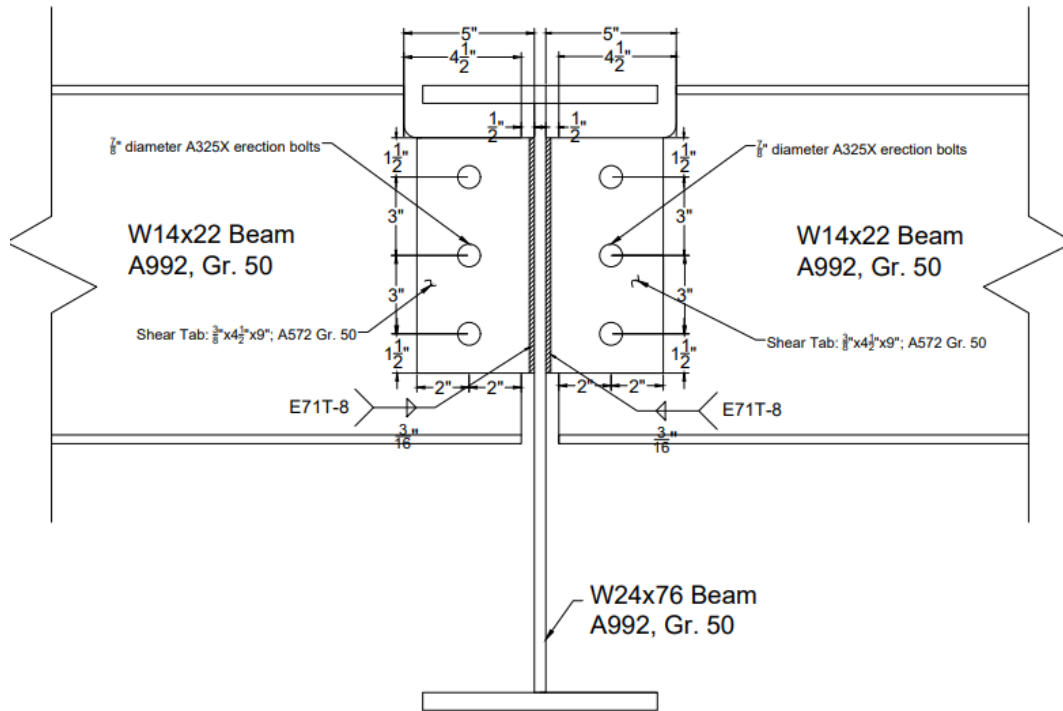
Side view of the double-sided W14x22 coped beam connection.
